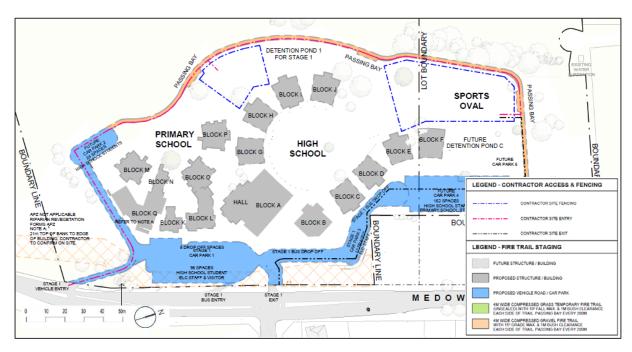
| Site Construction Arrangement – Stages 6a and 6b (source: SRtS 2019)
